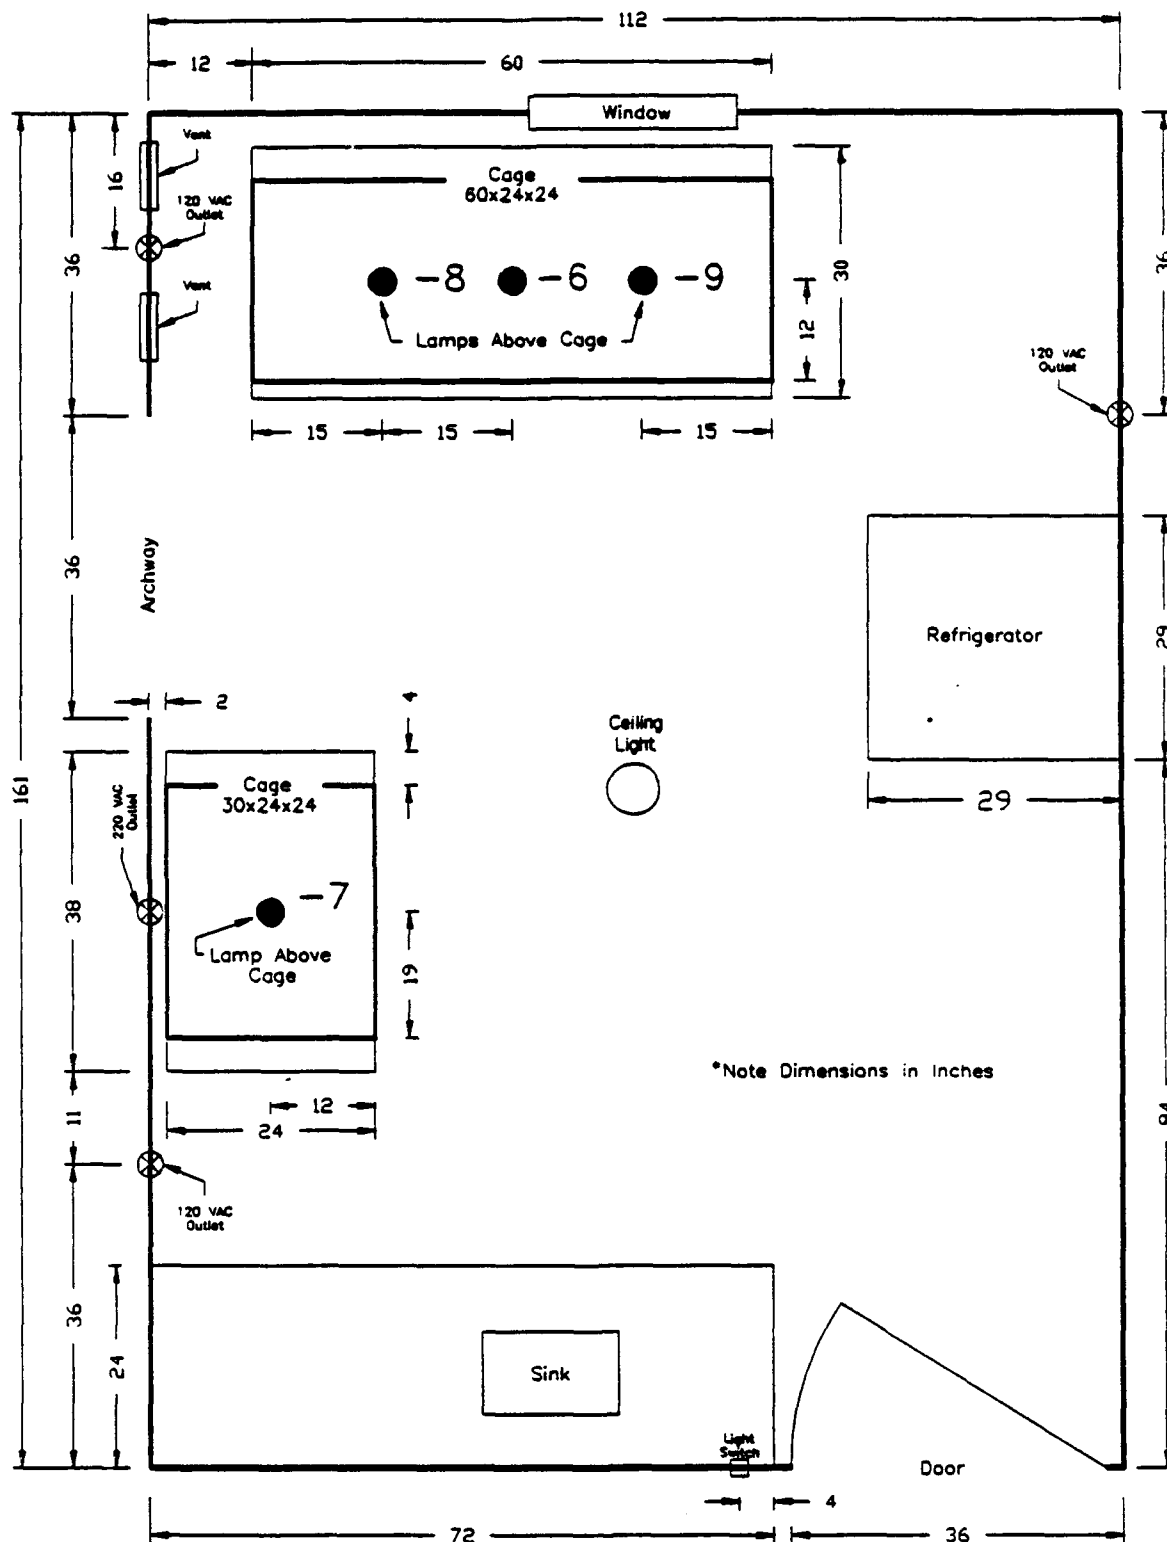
MEASUREMENT POINTS AT CRYSTAL FALLS LABORATORY, 2ND FLOOR WORK AREA; 2L1-6 THROUGH 9.
